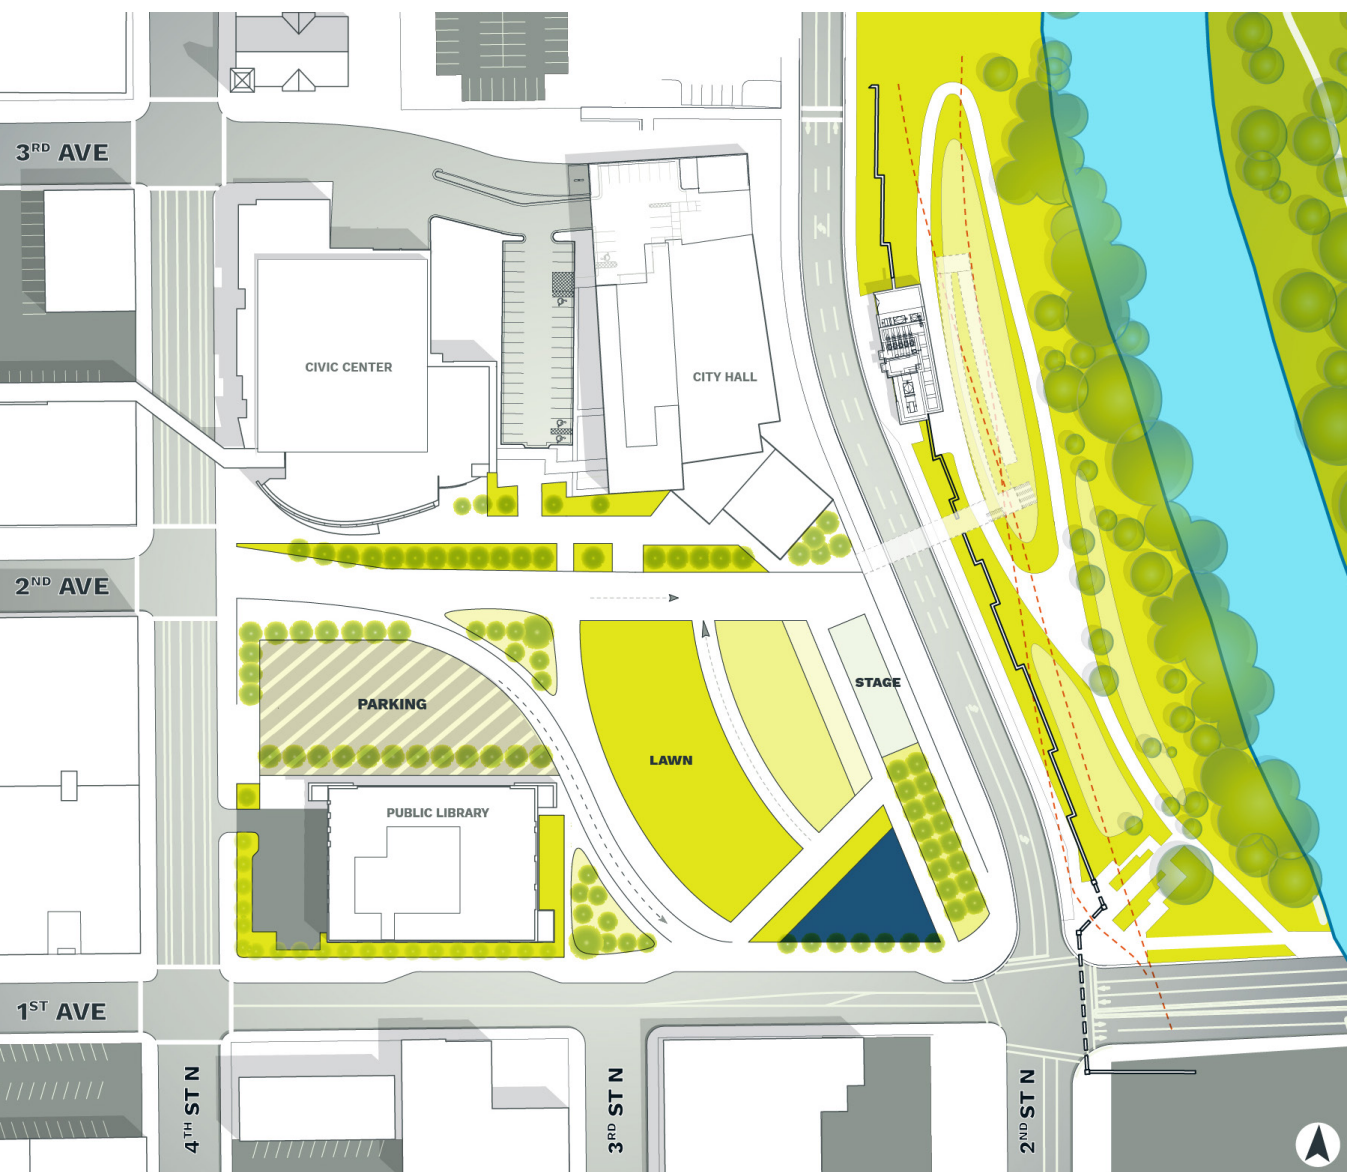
Conceptual Site Plan Alternative extending 2nd Ave through Site to River
